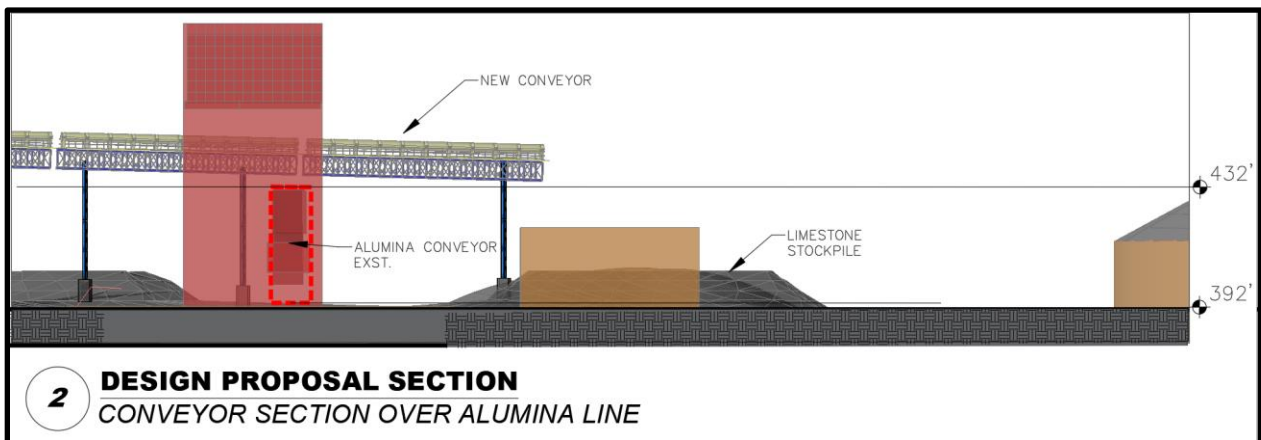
Design Showing Proposed Conveyor Clearing Existing Alumina Conveyor
